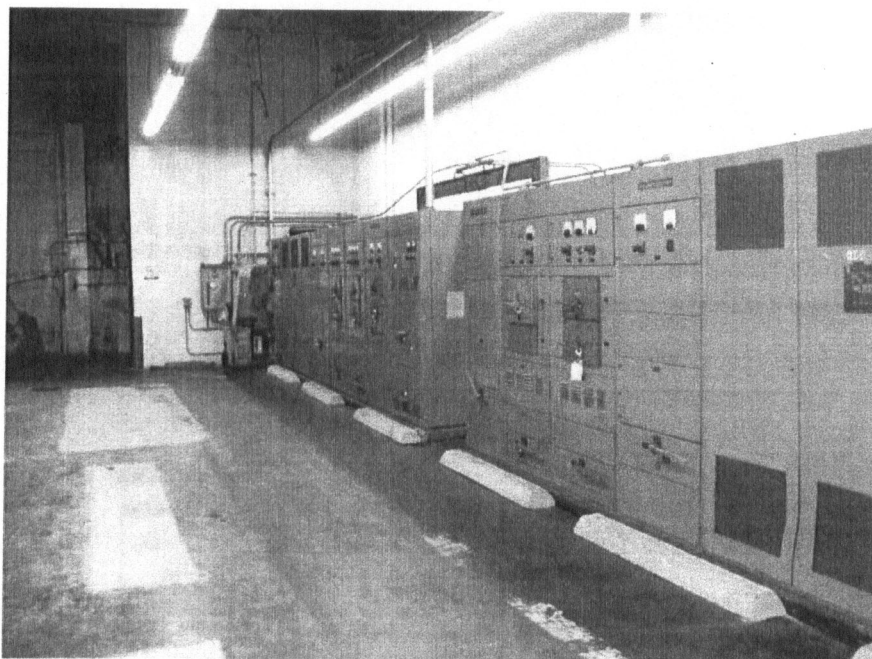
Facing west; view of the elevator mechanical room on the roof of Building 5A.
